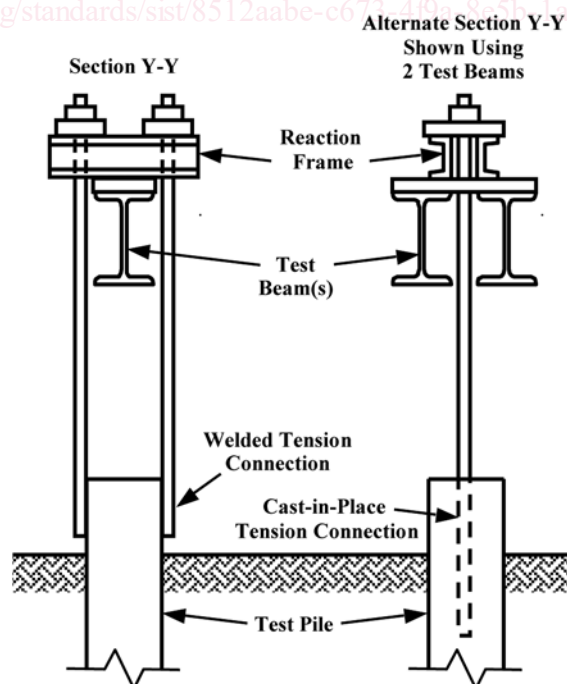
Typical Section Y-Y (Fig. 4, Fig. 6) of Test Beam(s) at Test Pile
